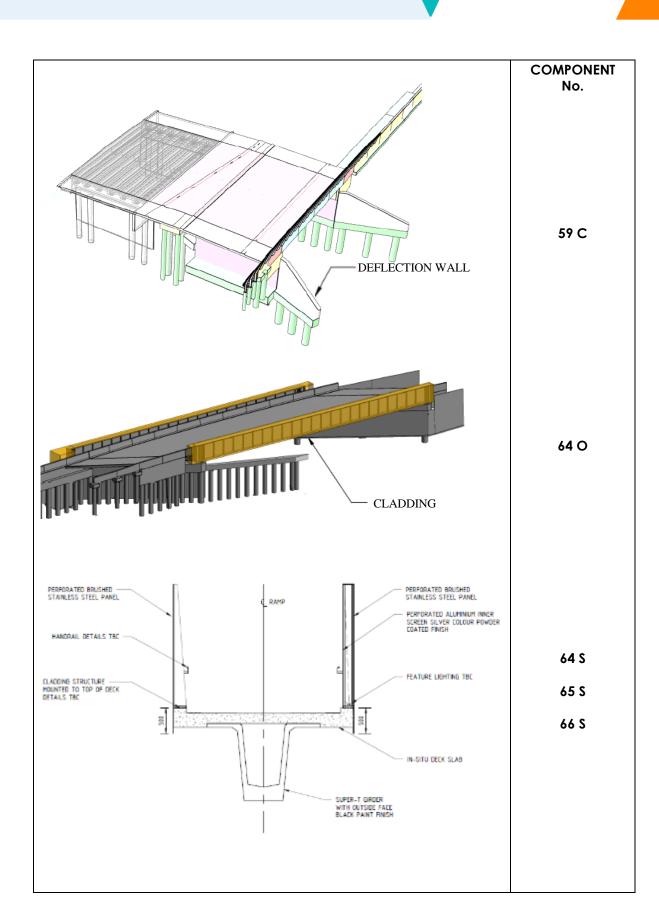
DEFLECTION WALL AND ON-STRUCTURE CLADDING
